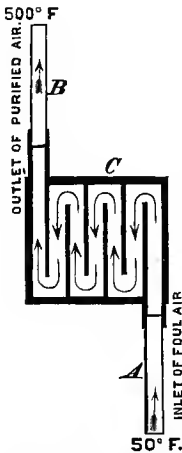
Section of air-chamber of Rand's house-drain ventilator.
